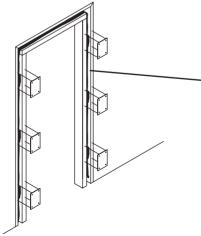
Running loudspeaker wire between a wall and a removed doorjamb. Nail plates are also installed to protect the wire when the doorjamb is replaced.
